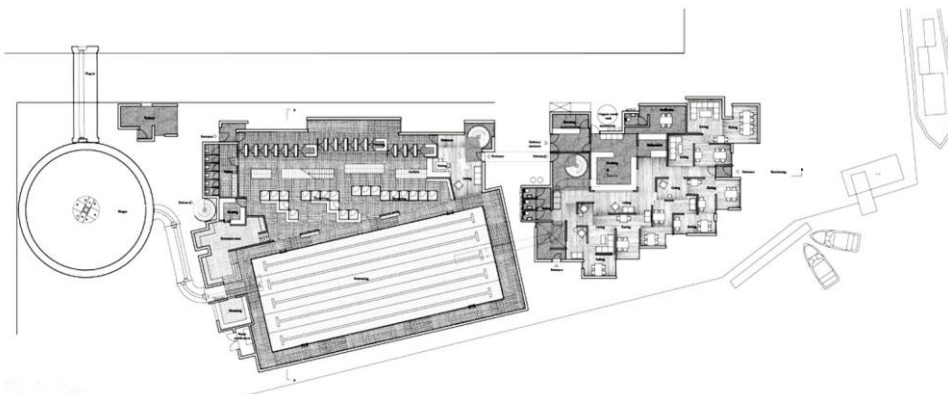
Arrival between the biogas power plant and the bathhouse facilities
